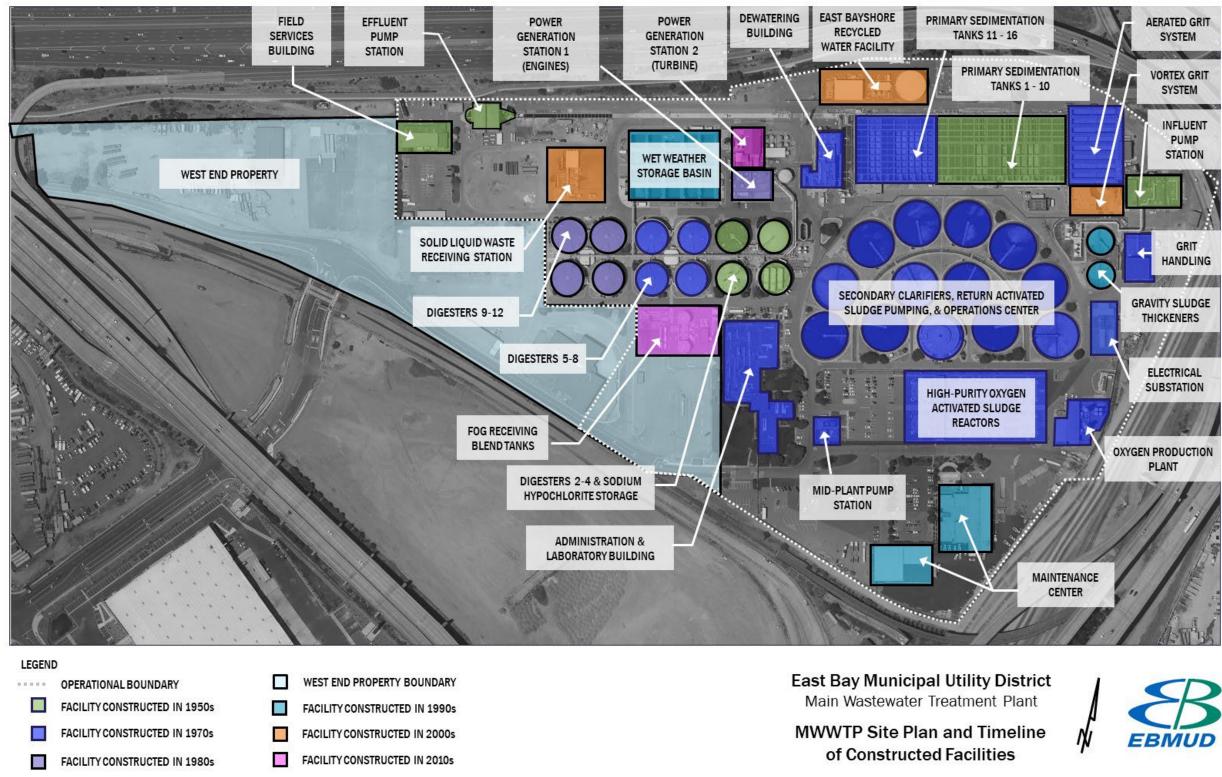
MWWTP site plan and timeline of constructed facilities
